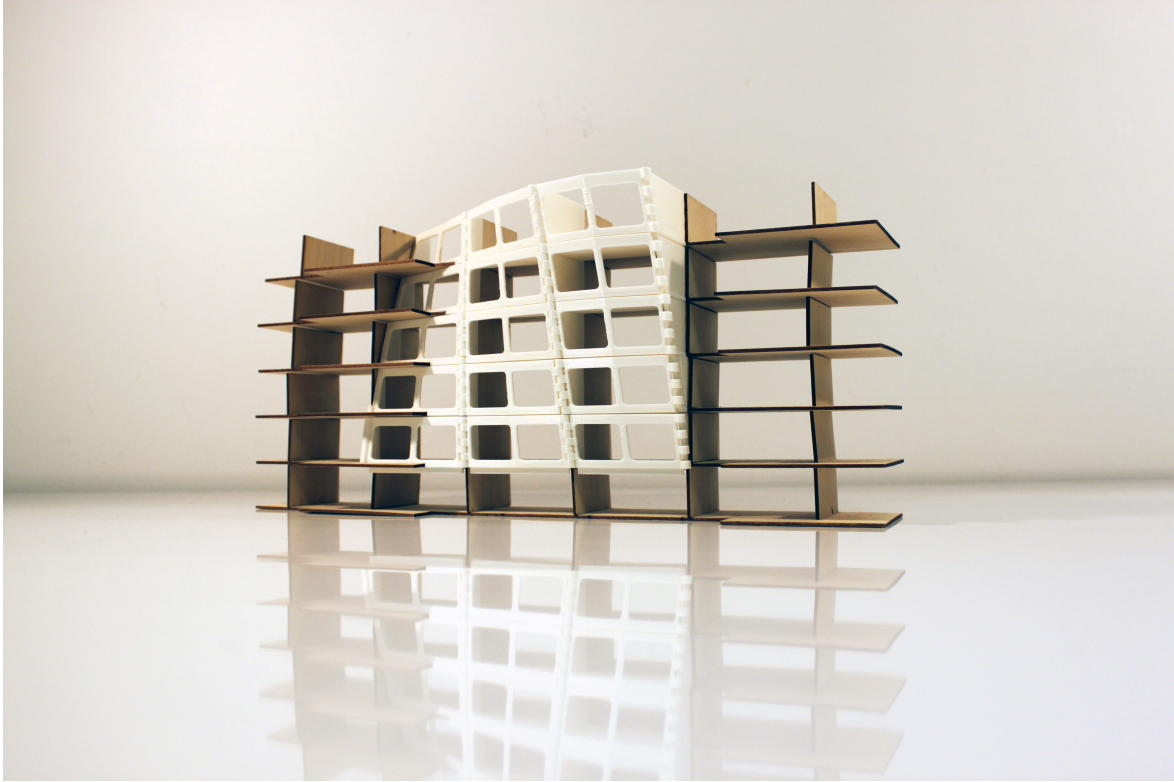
Photograph of 3D printed physical model (front view).
